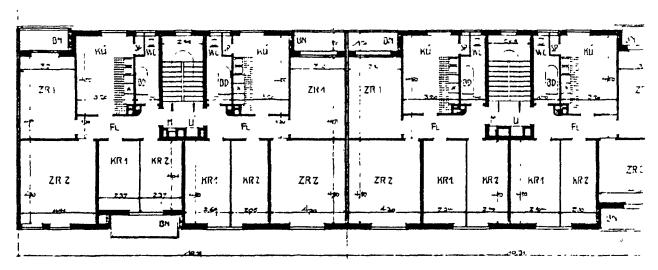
Hamburg-Jarrestadt. Typical dwelling arrangement. Plan: 2R - room, KU - kitchen, KR - small room, SP - food storage, BN - balcony, BD - bath, M - refusal shaft, FL - hallway. (Adler, 1931)
